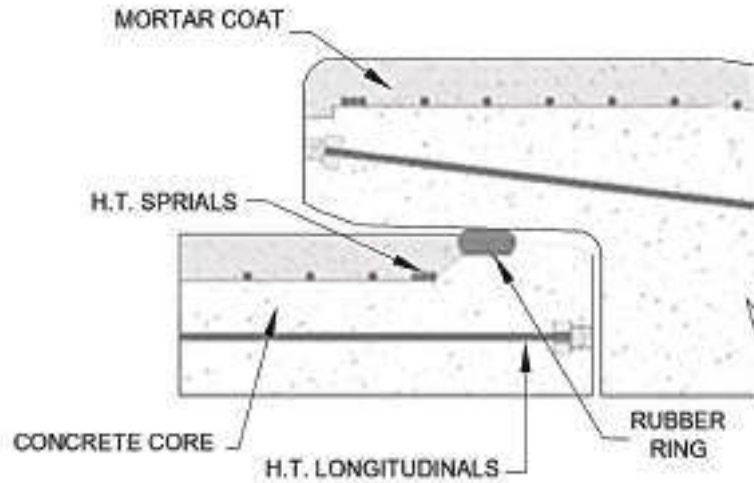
PSC (Non-Cylinder Type) Pipe Confined Joint Details
